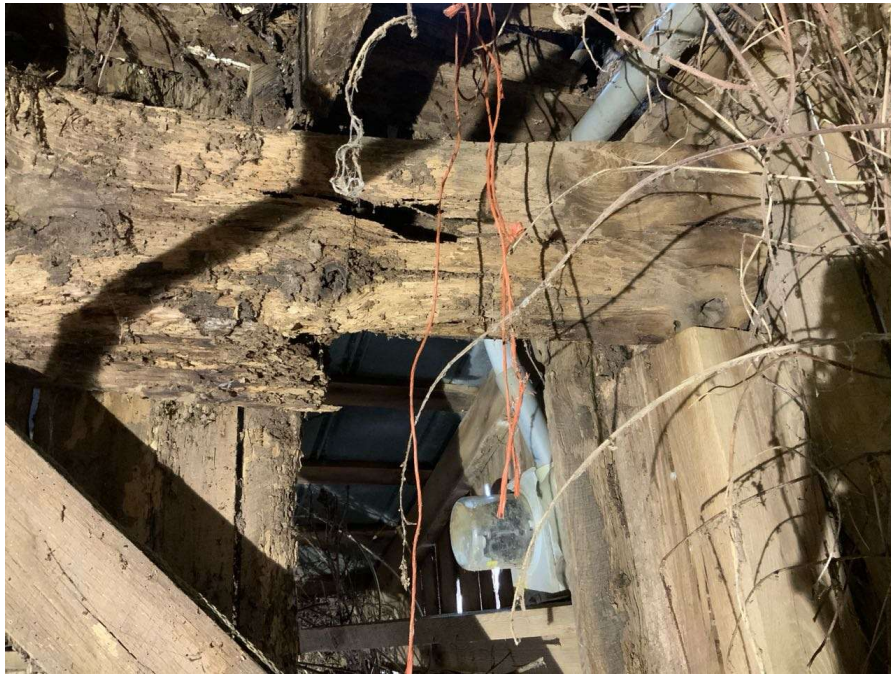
Critical finding at floor beam between Columns B/4 and C/4. The west end of the beam has approximately 90% section loss.
